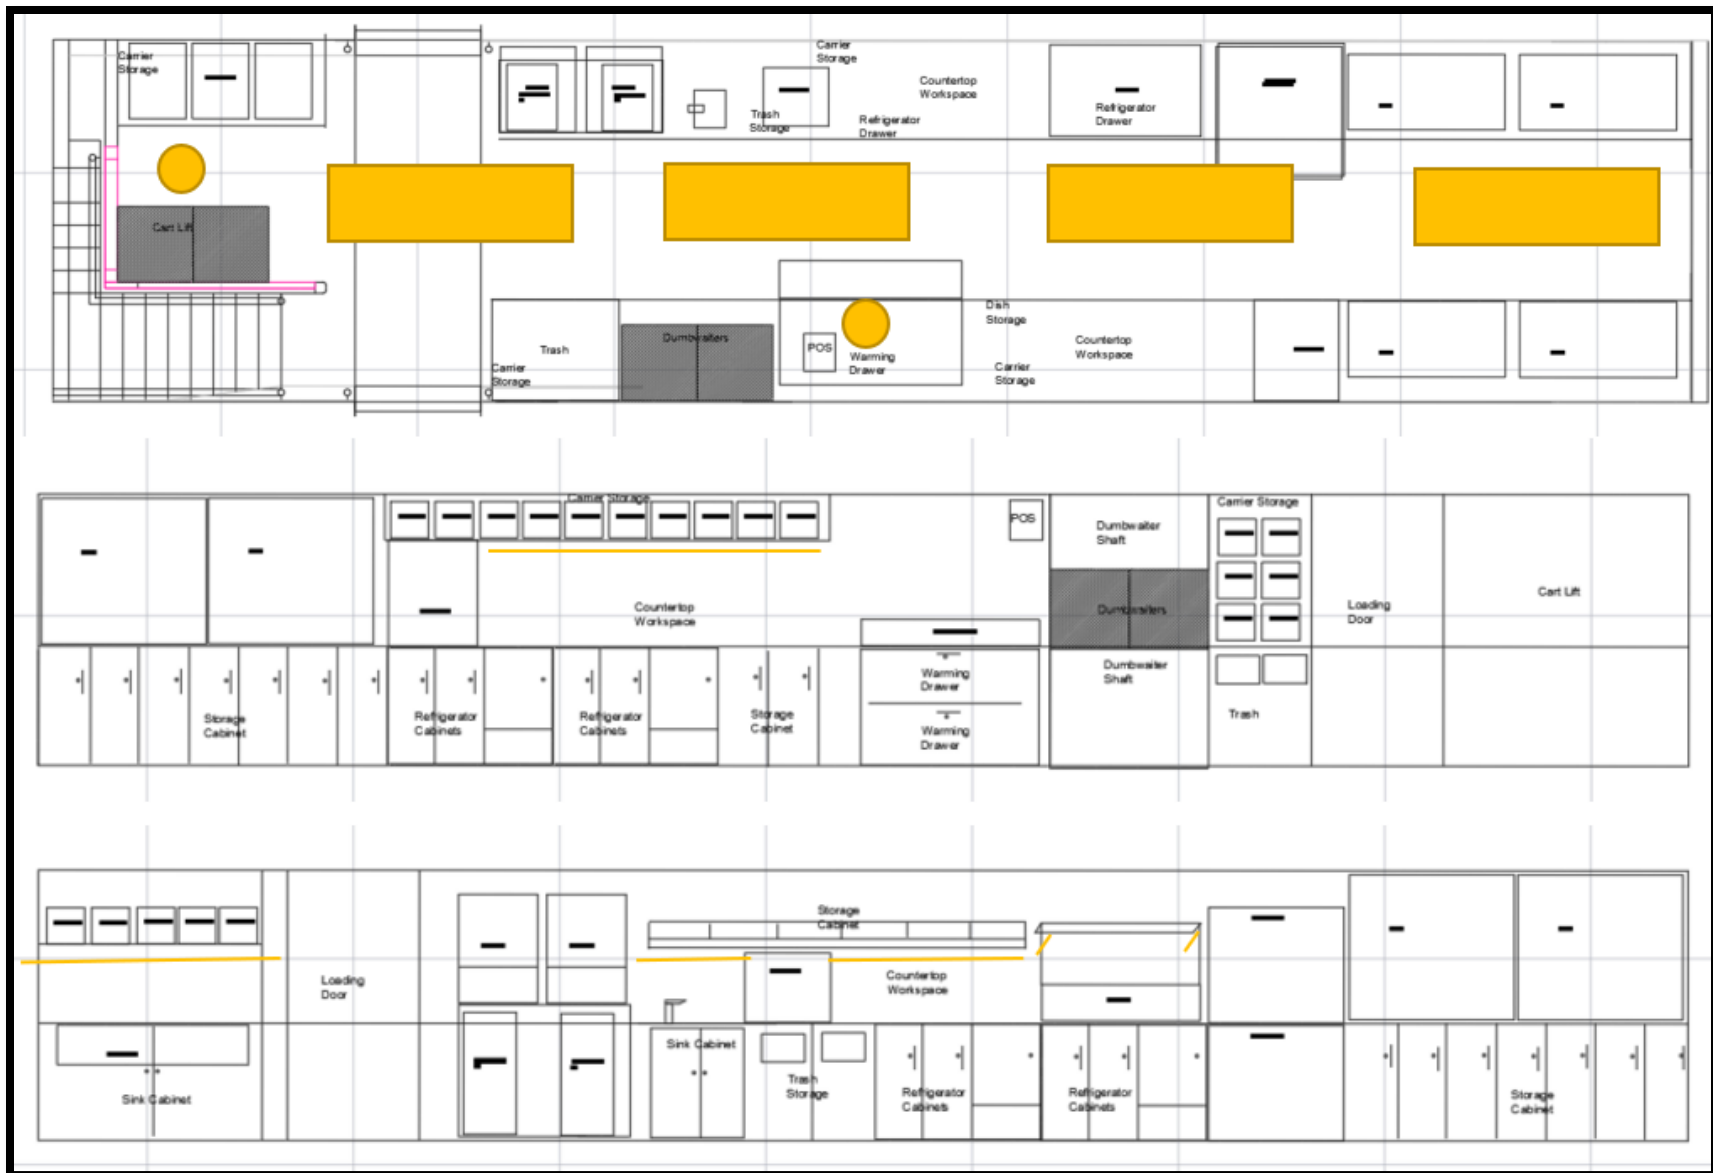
Kitchen Layout - Overhead and Shelf Lighting General Locations
